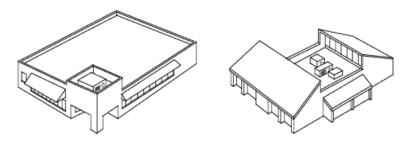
B.1: Examples of how to screen roof-mounted mechanical equipment.
